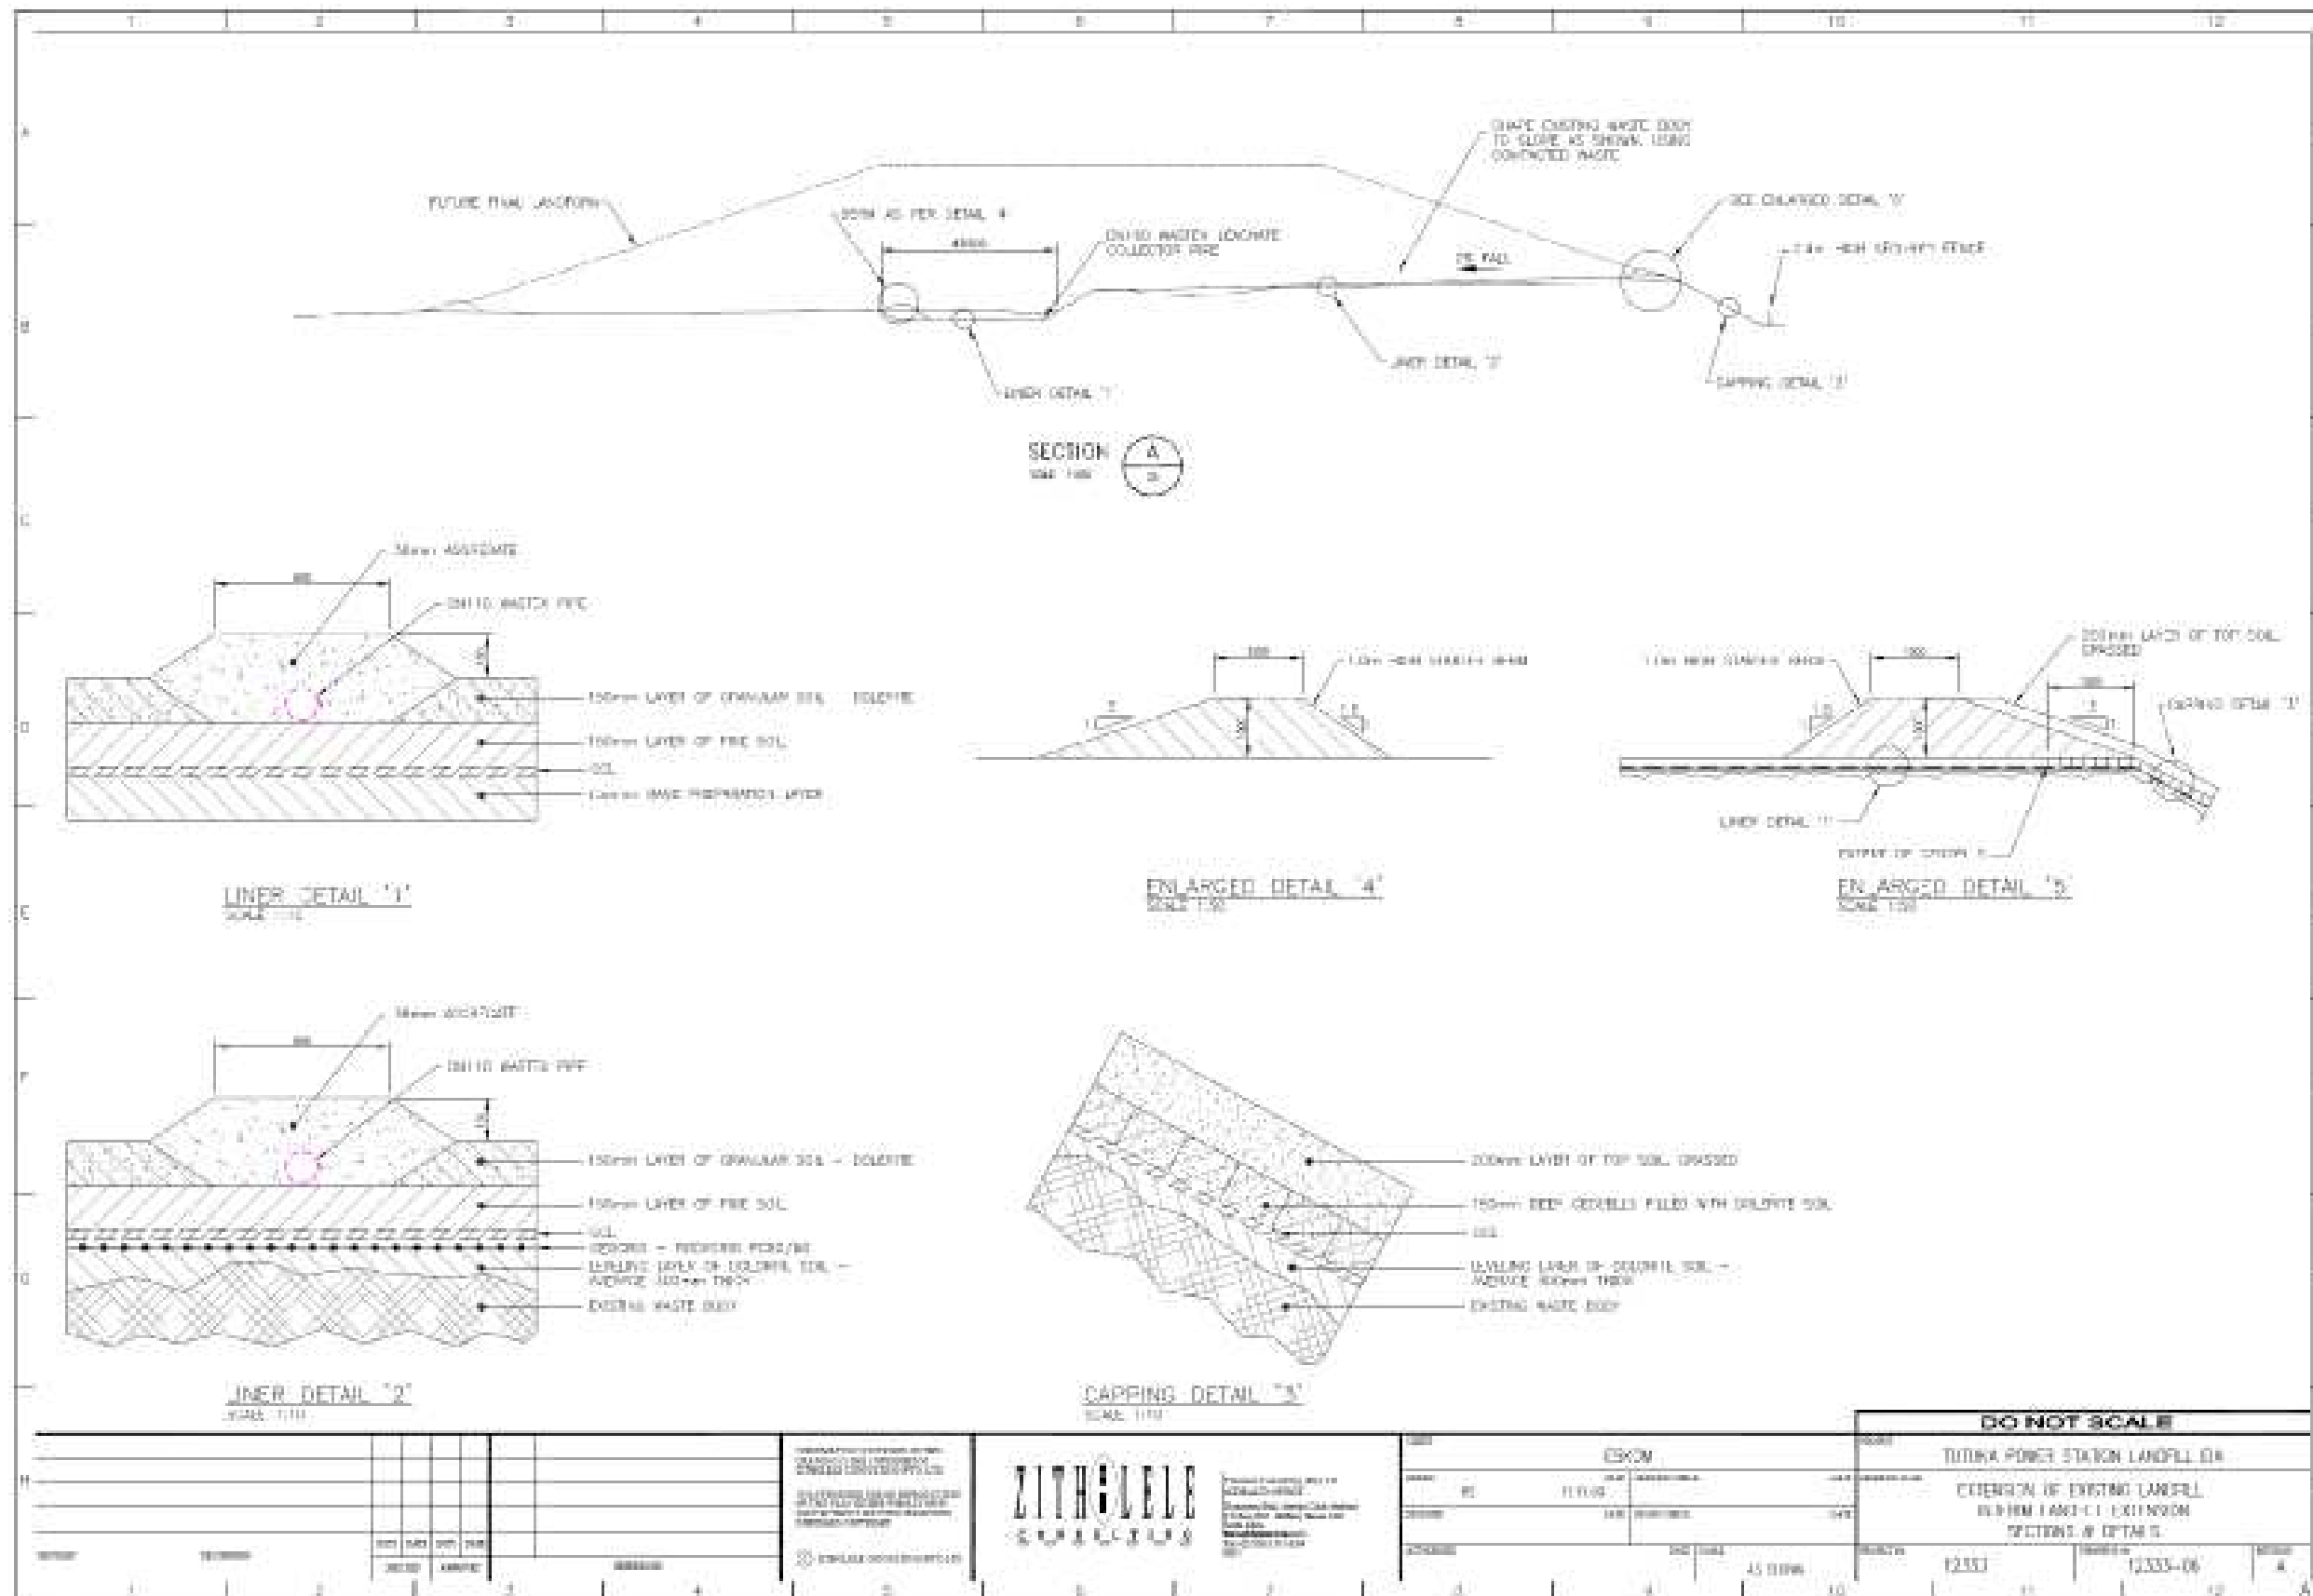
Capping and Liner Design for the interim disposal site extension
